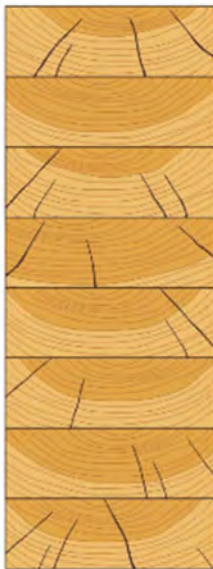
Glulam cross-section with pit location pointing upwards and radial cracks
